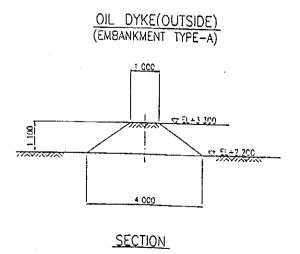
PLANNING DRAWING FOR OIL STORAGE TANKS
